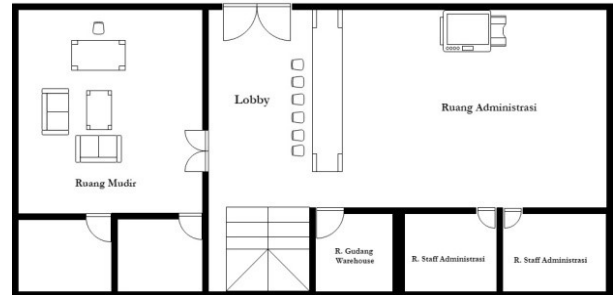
Floor plan of the first floor of the ma'had headquarters
